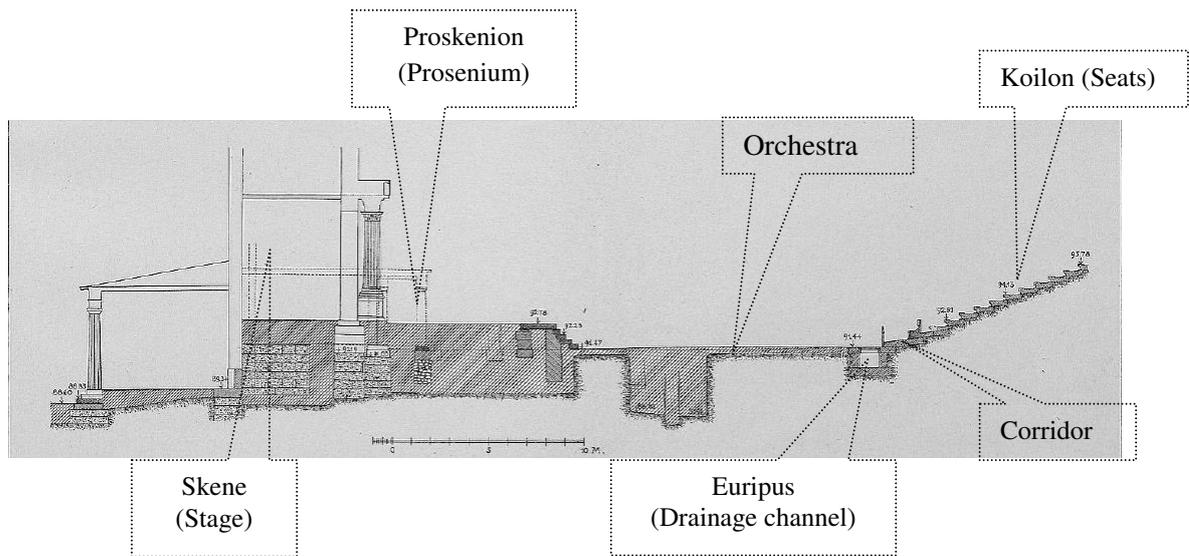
Typical longitudinal cross-section of a Greek theatre (arranged by K. Kollyropoulos on a base drawing adapted from Döperfeld's plans, 1896)
